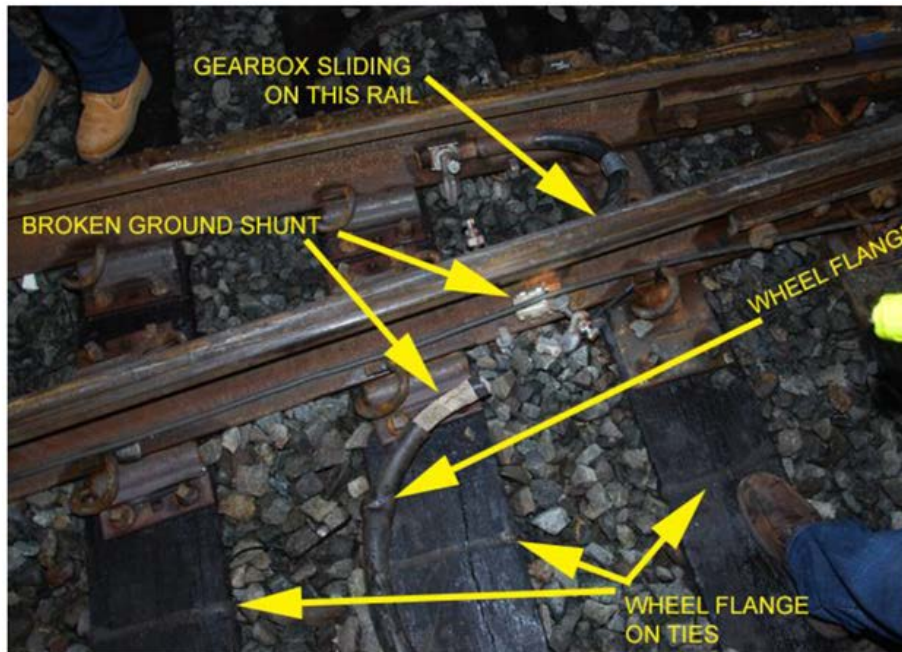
Broken roadway ground shunt clamp and tie damage.
